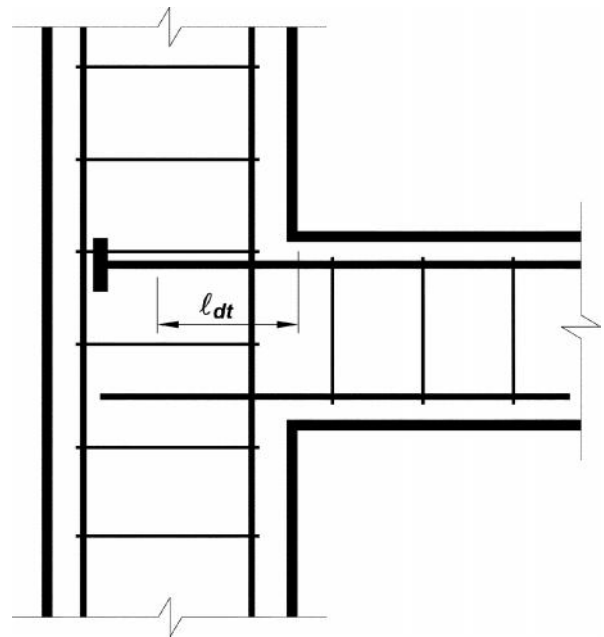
(b)—Headed deformed bar extended to far side of column core with anchorage length that exceeds l_{dt} .
